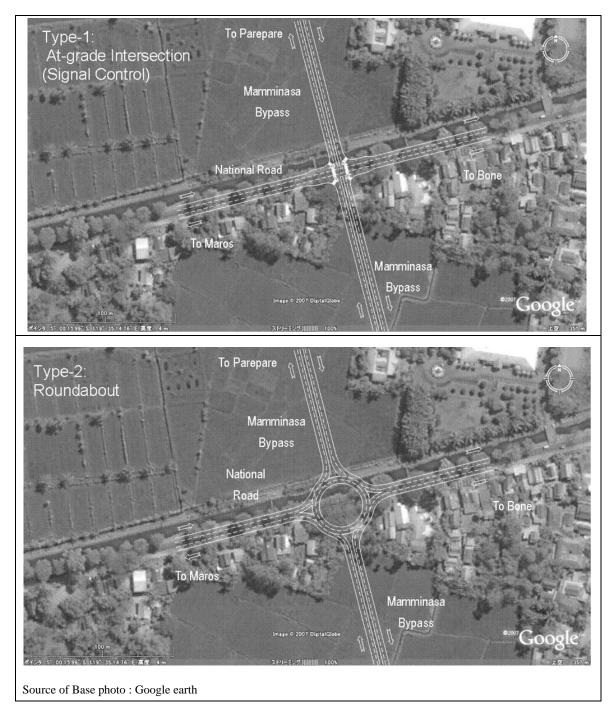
(2) Alternative Intersection Plans for MB-3 IC
